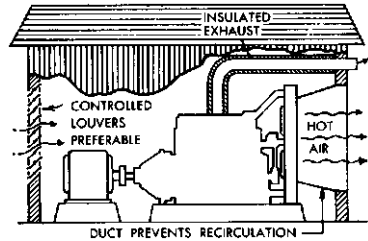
Radiator cooling system for an inside installation (Waukesha Motor)
